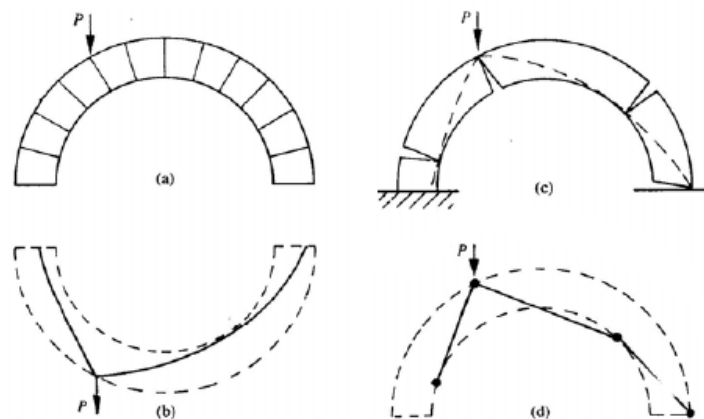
Collapse of a semicircular masonry arch under a point load (Heyman, 1995)
